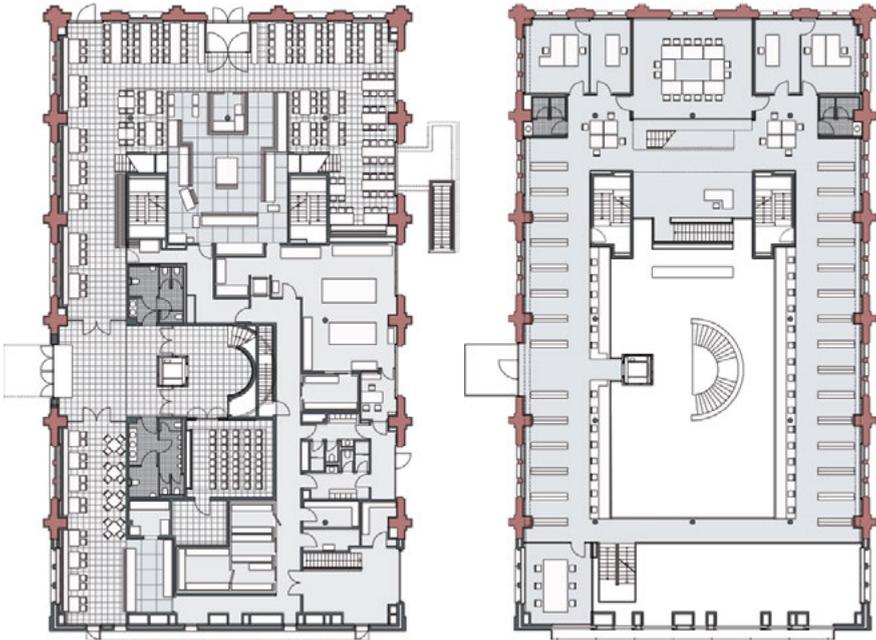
The ground floor (left) and 3rd floor (right) of the new library. © Chestnutt_Niess Architects.
